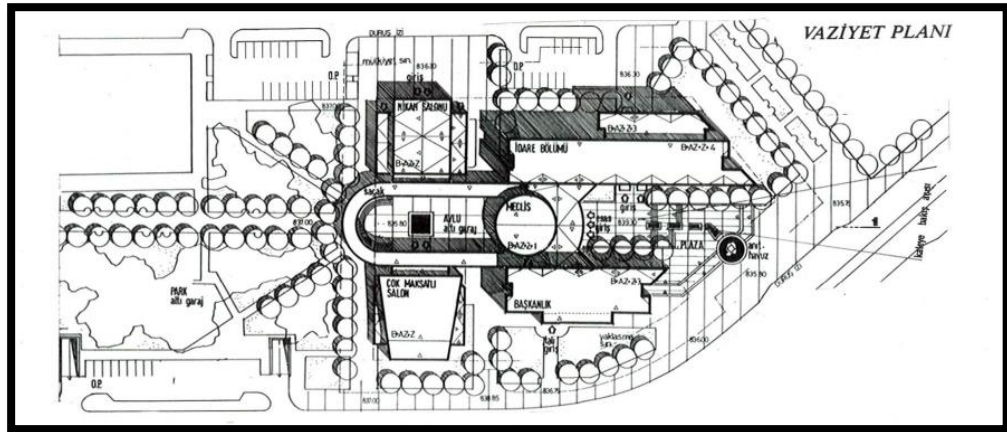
Gaziantep Municipality Service Building Competition, First Prize, Site plan (Anonymous, 87)
